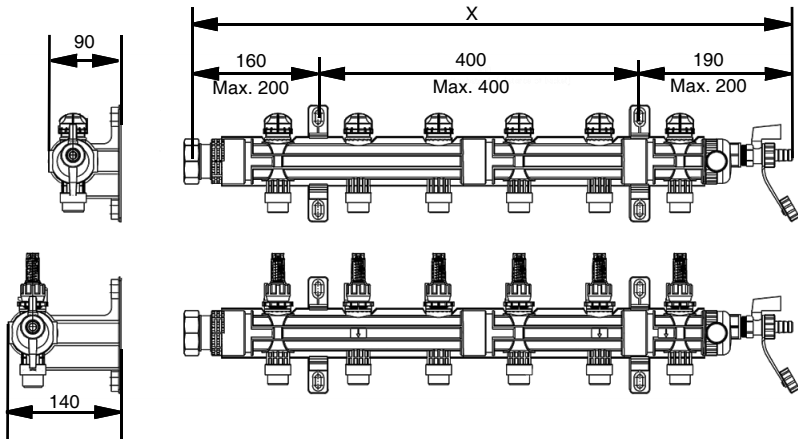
Dimensions in mm ProCalida® IN G1½ with the standard base package
